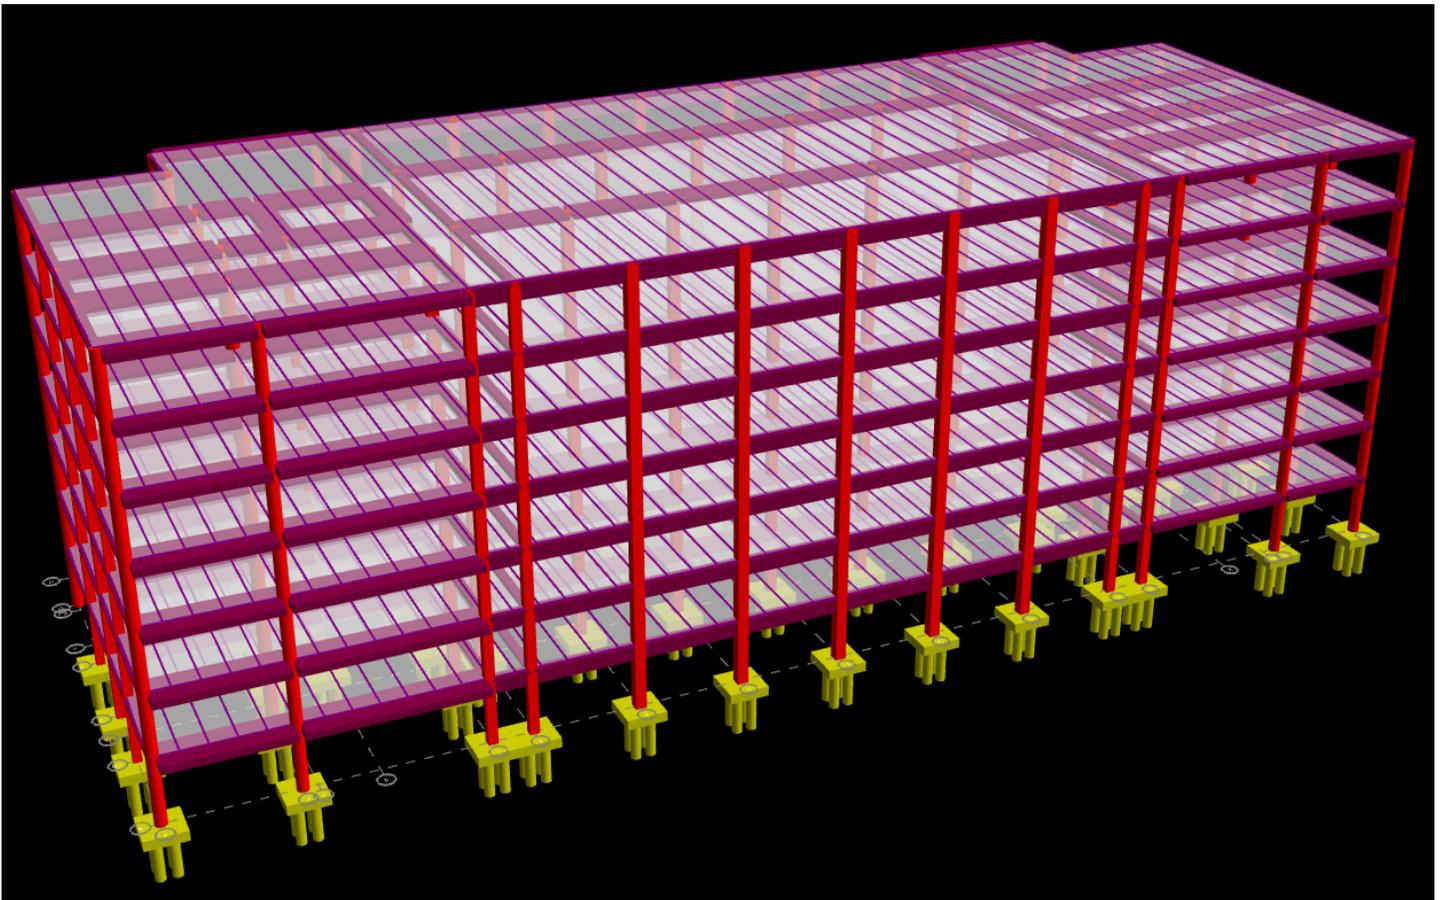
Model of BMR viewed from the south face. It should be noted that the north and east sides of the building have additional buildings that would impact the amount of wind that this building would see. The south and west sides are exposed.
